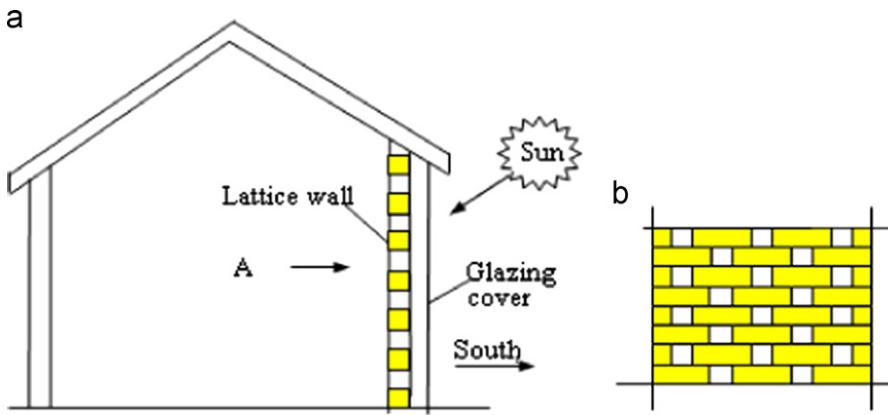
Lattice wall and lattice solar wall heated building [37]. (a) Lattice solar wall heated building. (b) Lattice wall from view A.
